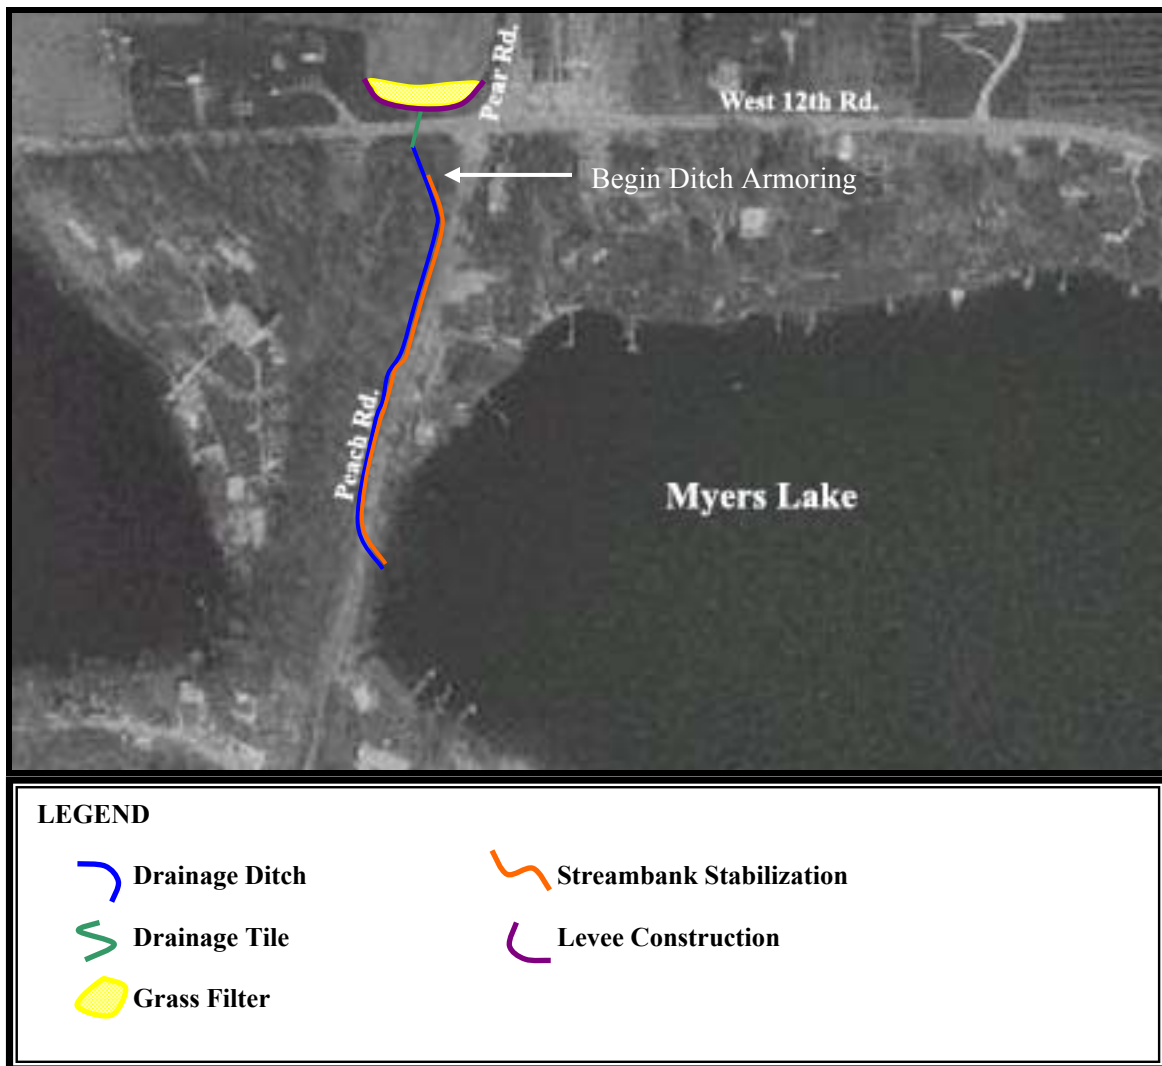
Preliminary plan view of sediment basin construction and stream hard armoring at West 12th and Pear Roads.
